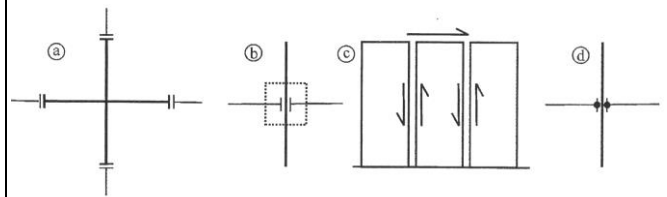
a) connection located outside critical regions; b) oversized connection with plastic hinges shifted outside the connection; c) ductile shear connections of large panels located within critical regions (e.g. at ground floor); and d) ductile continuity connections located within critical regions of frames
